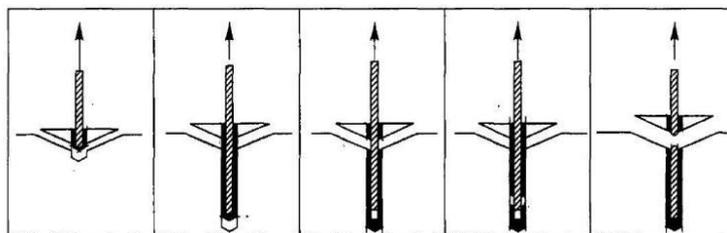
Five Failure Modes of post-installed rebar Drawing
